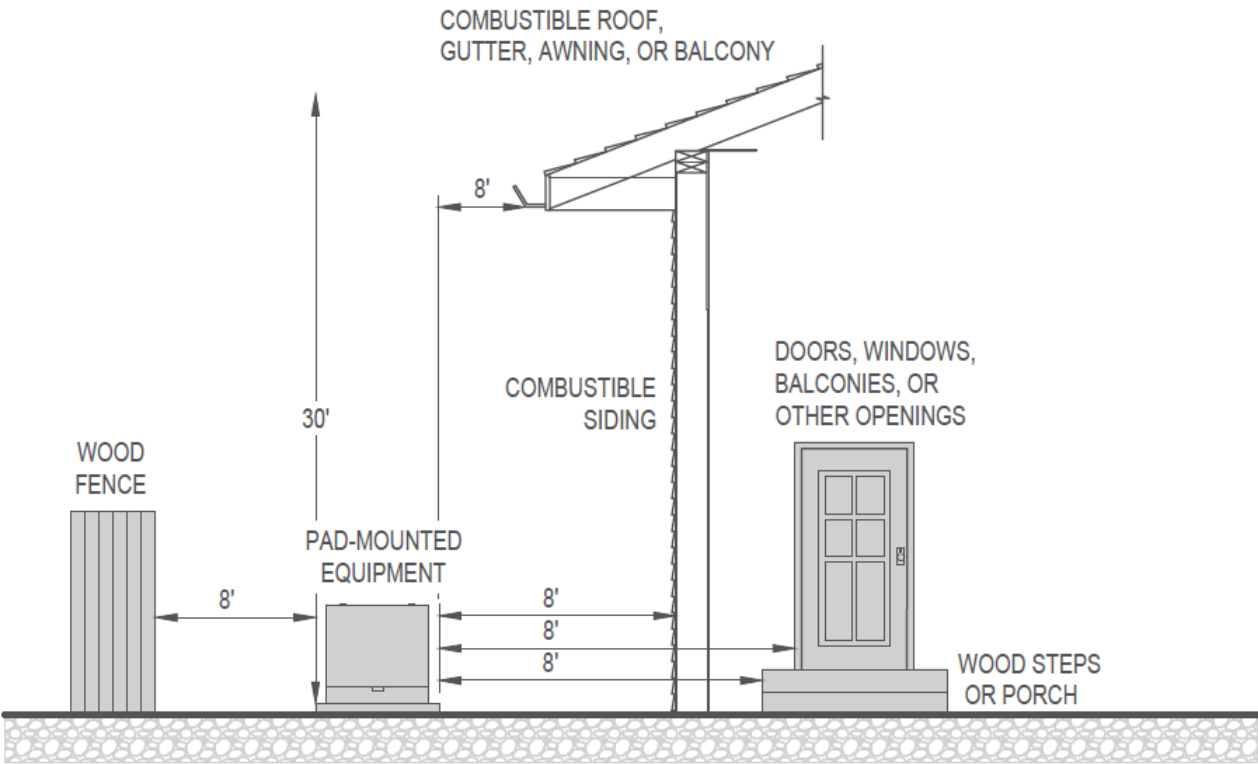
Minimum Clearances from the Side or Back of a Transformer to a Combustible Surfaces (STD-D-3215)
